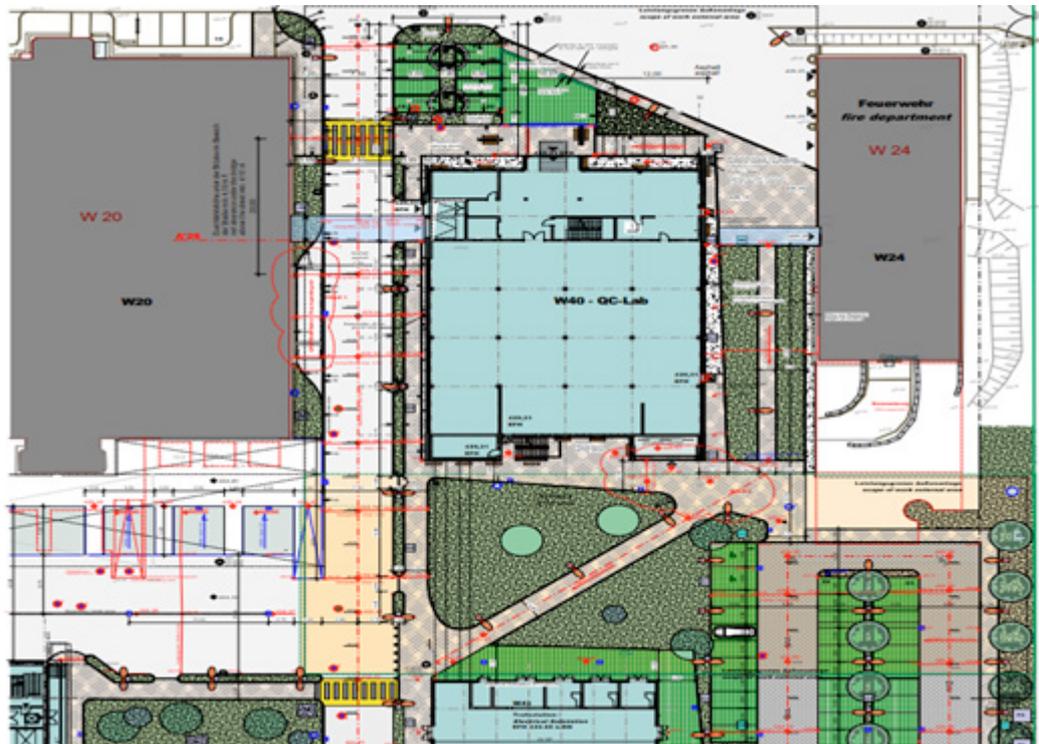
Quality Control Laboratory Building W40 (in light green, centre of the picture) and electrical substation (in light green, bottom of the picture)
